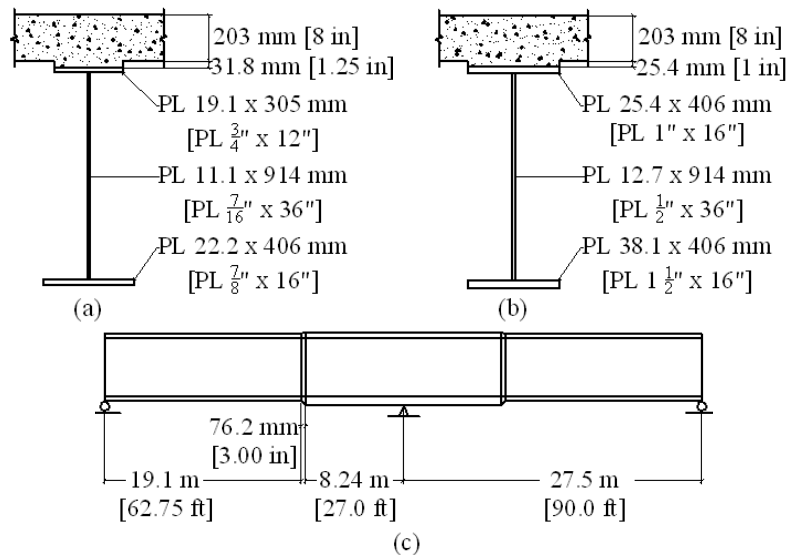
(a) Positive girder cross-section. (b) Negative girder cross-section. (c) Location of positive and negative cross-sections.
